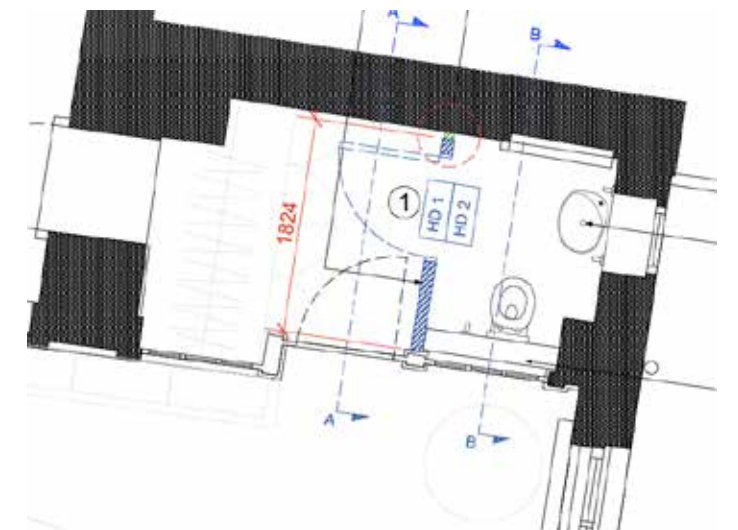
Proposed plan of the Waiting Room with ambulant W.C
